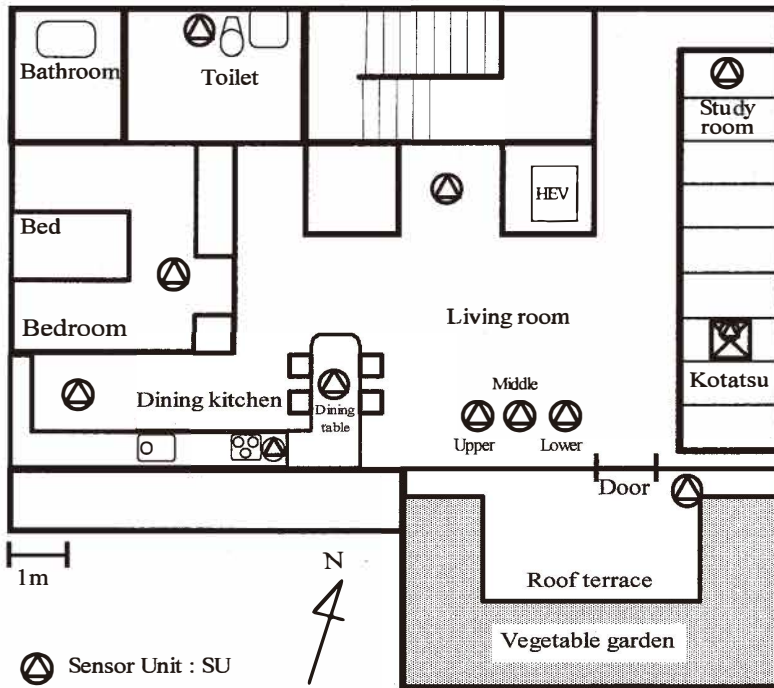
Floor plan of welfare oriented residence and points of installation of SUs.
